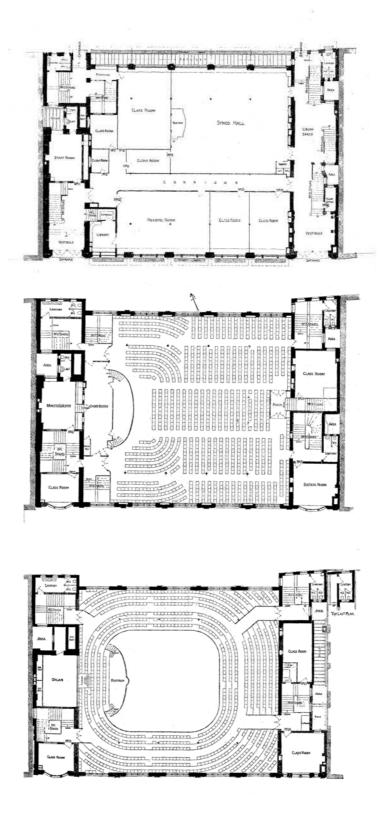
Top to Bottom: Ground, First and Second floor plans of the Albert Hall, Manchester (1911). Source: Modern Buildings Record, 1912.
